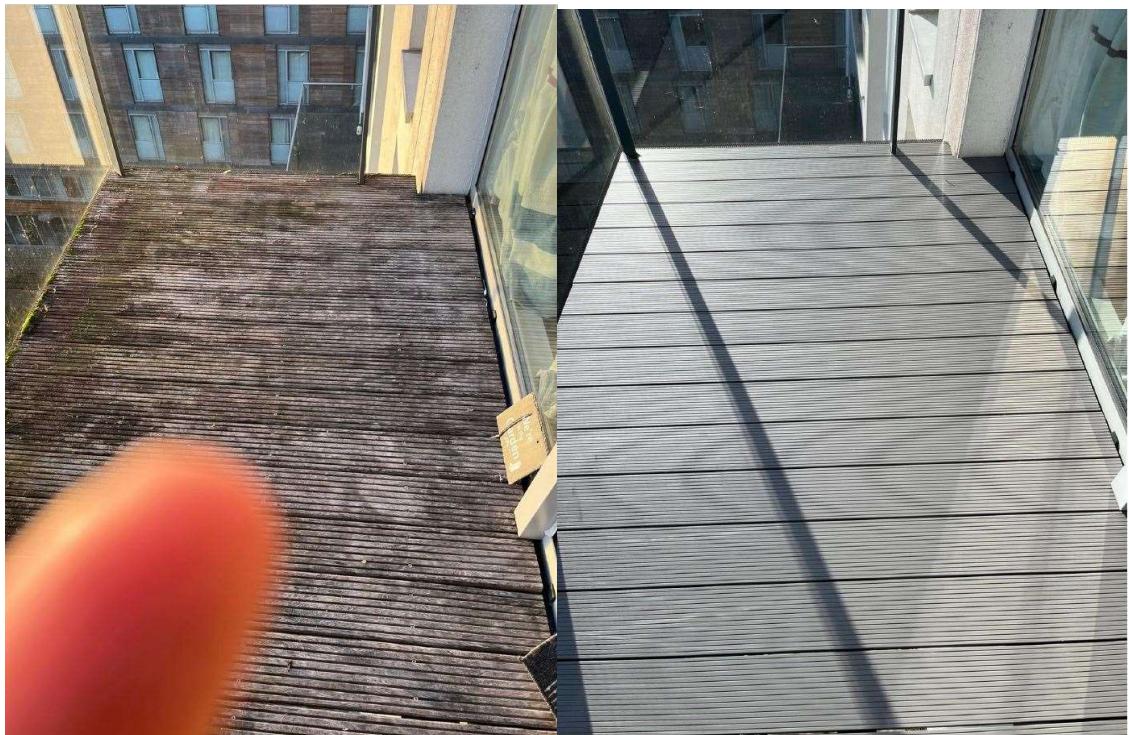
Fifth Example of a completed balcony decking replacement; the left-hand side photo shows the original timber decking balcony, the right-hand side photo shows the same balcony and the completed aluminium decking replacement.
